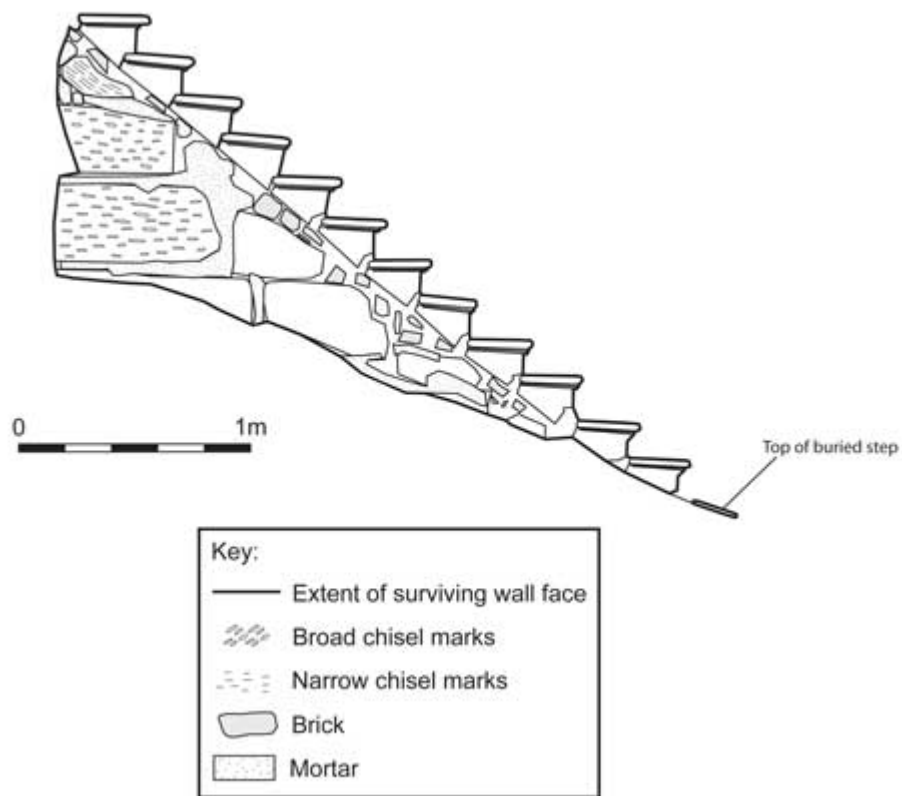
Structure 2, East Stair: Elevation c (west wall of stair)
